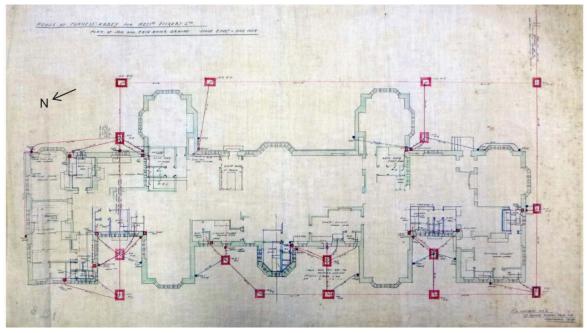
1914 plan of the Hotel, showing drainage (CAC(B) BA/S/H/23 1914)
